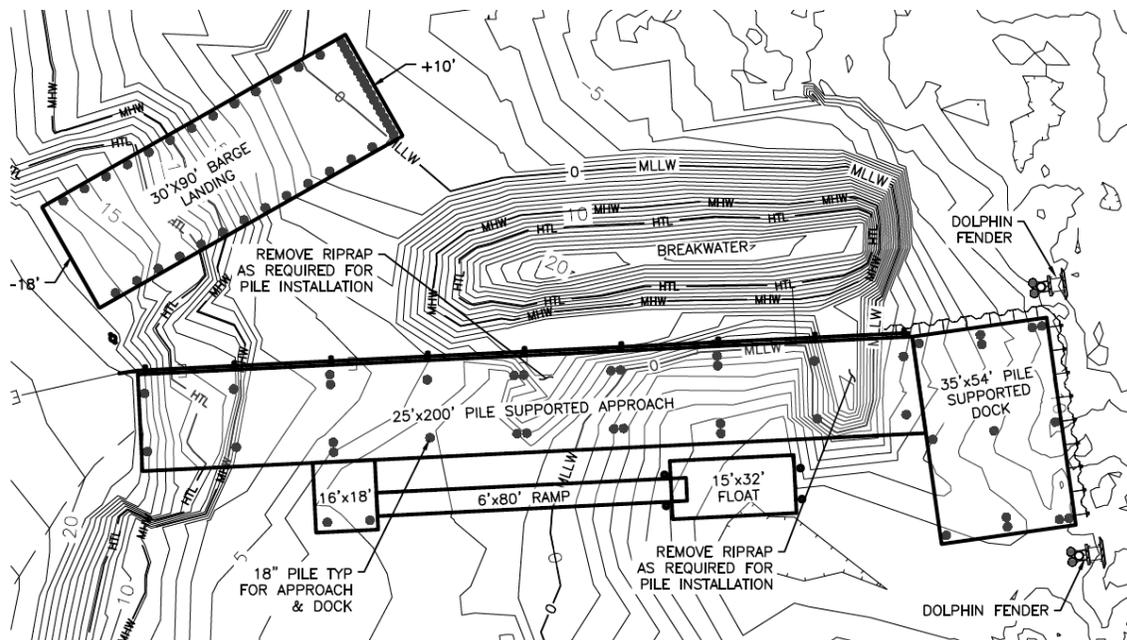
Diagram of the main structures for the Biorka Dock Replacement project, showing the barge landing platform, the dock/trestle, and the dolphin fenders. A wave barrier will also be installed around two sides of the dock (Pers comm 2016).
